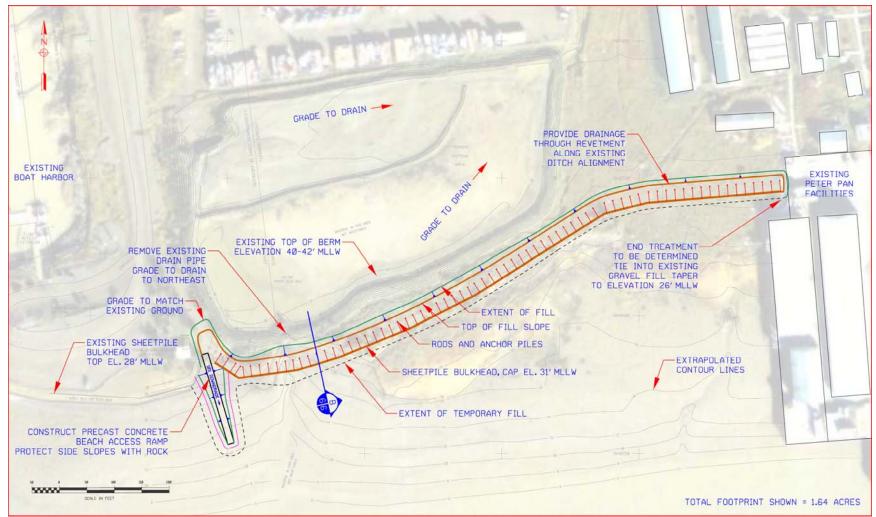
, Alternative C4 – Sheetpile: Project Plan/Site Map
